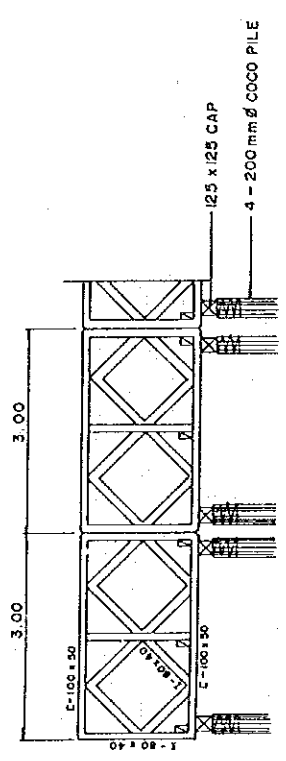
WOODEN BRIDGE REINFORCING PLAN
